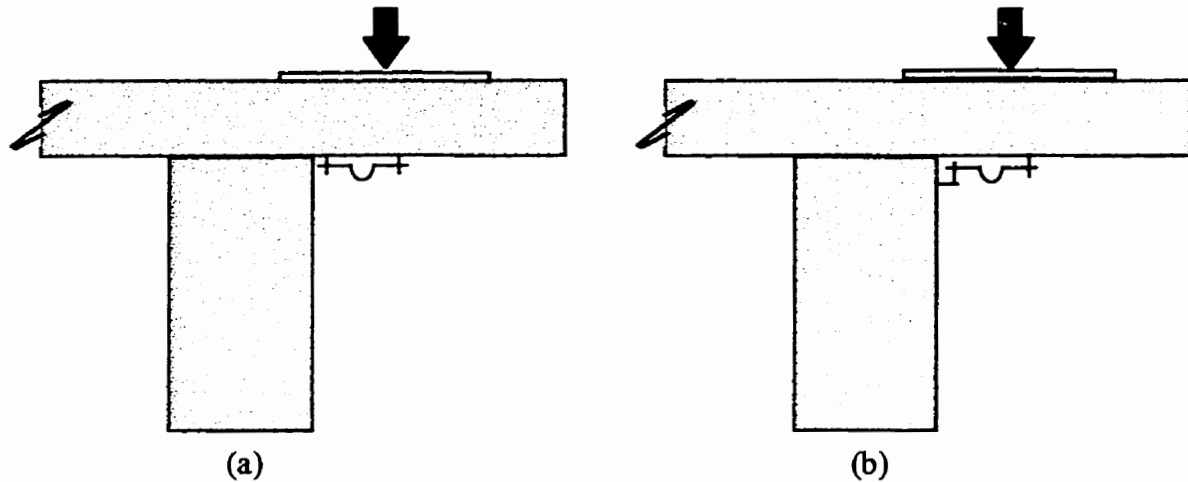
PI Gauge Configurations: (a) Slab Only; (b) Including Girder Face
